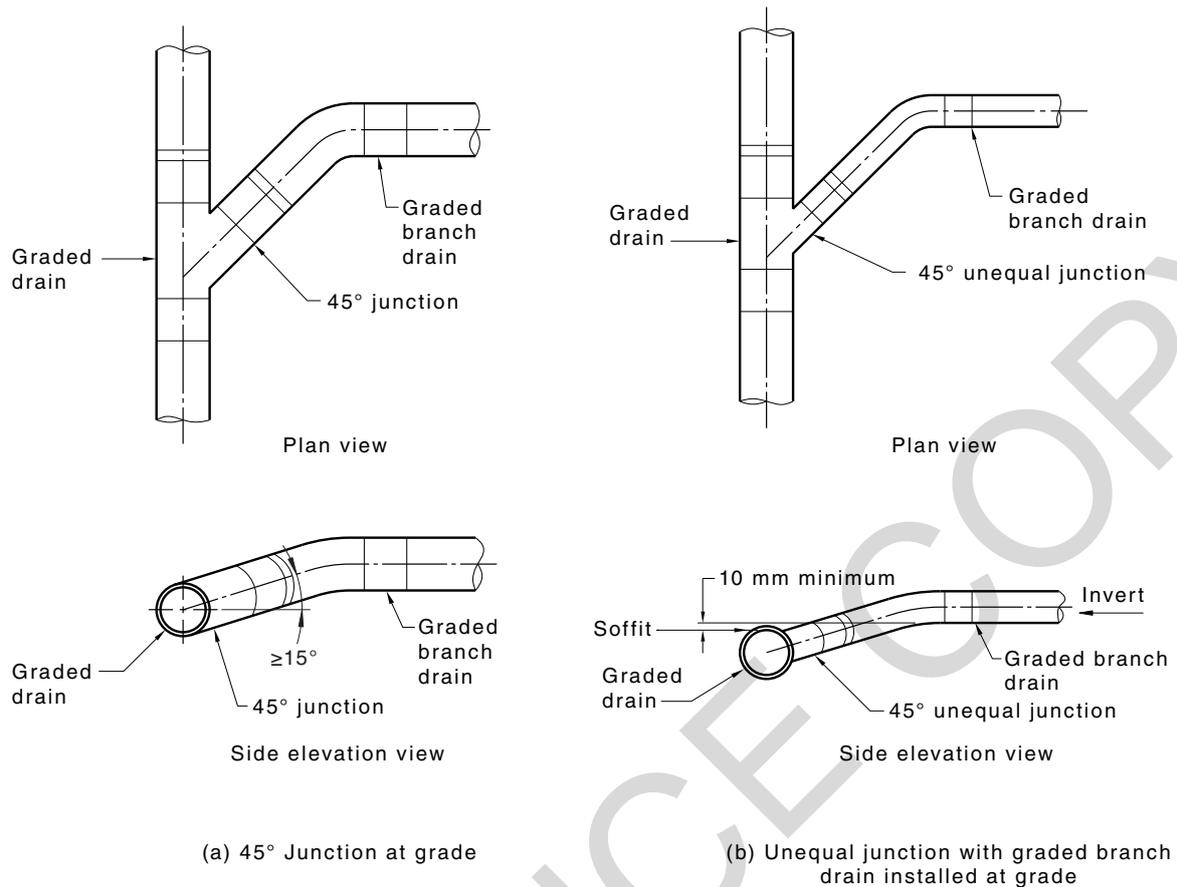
TYPICAL ARRANGEMENT FOR GRADED BRANCH DRAINS ENTERING MAIN DRAIN
